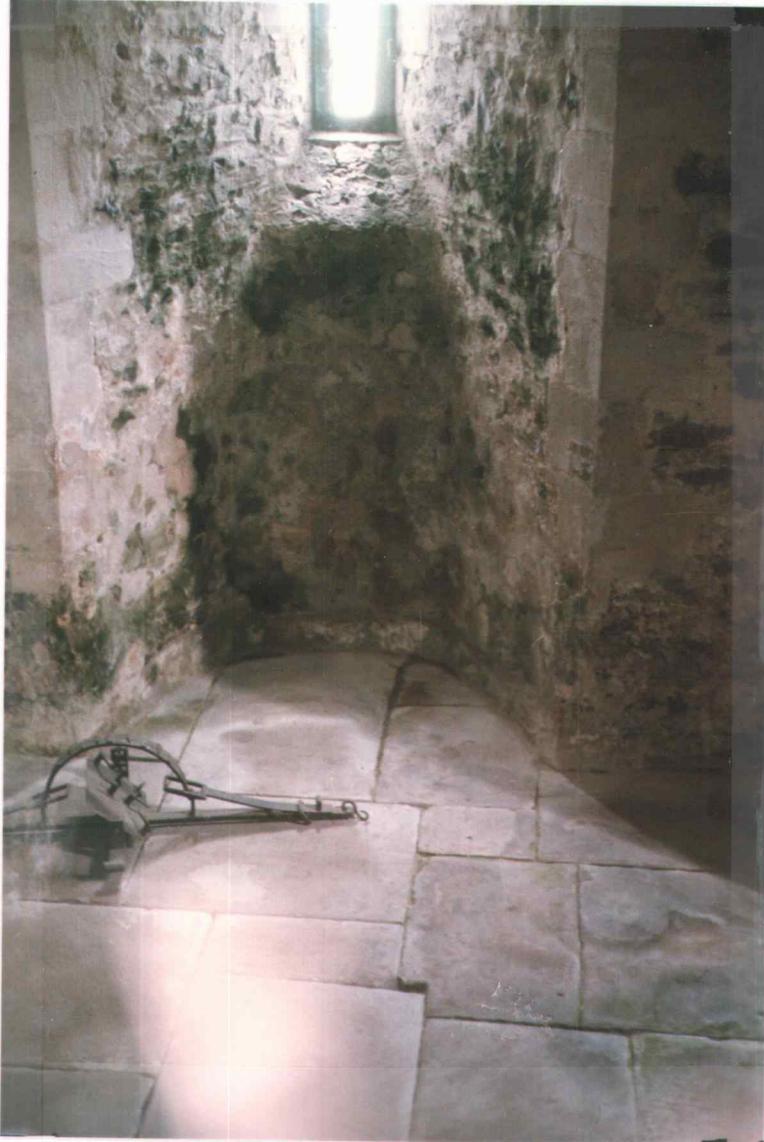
View of undercroft showing stone floor, rough walls and slit window.
